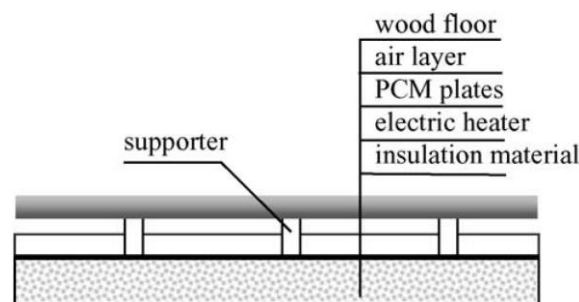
Example section with underfloor heating and shape stabilised PCM. Extracted from Lin *et al.* (2005).
